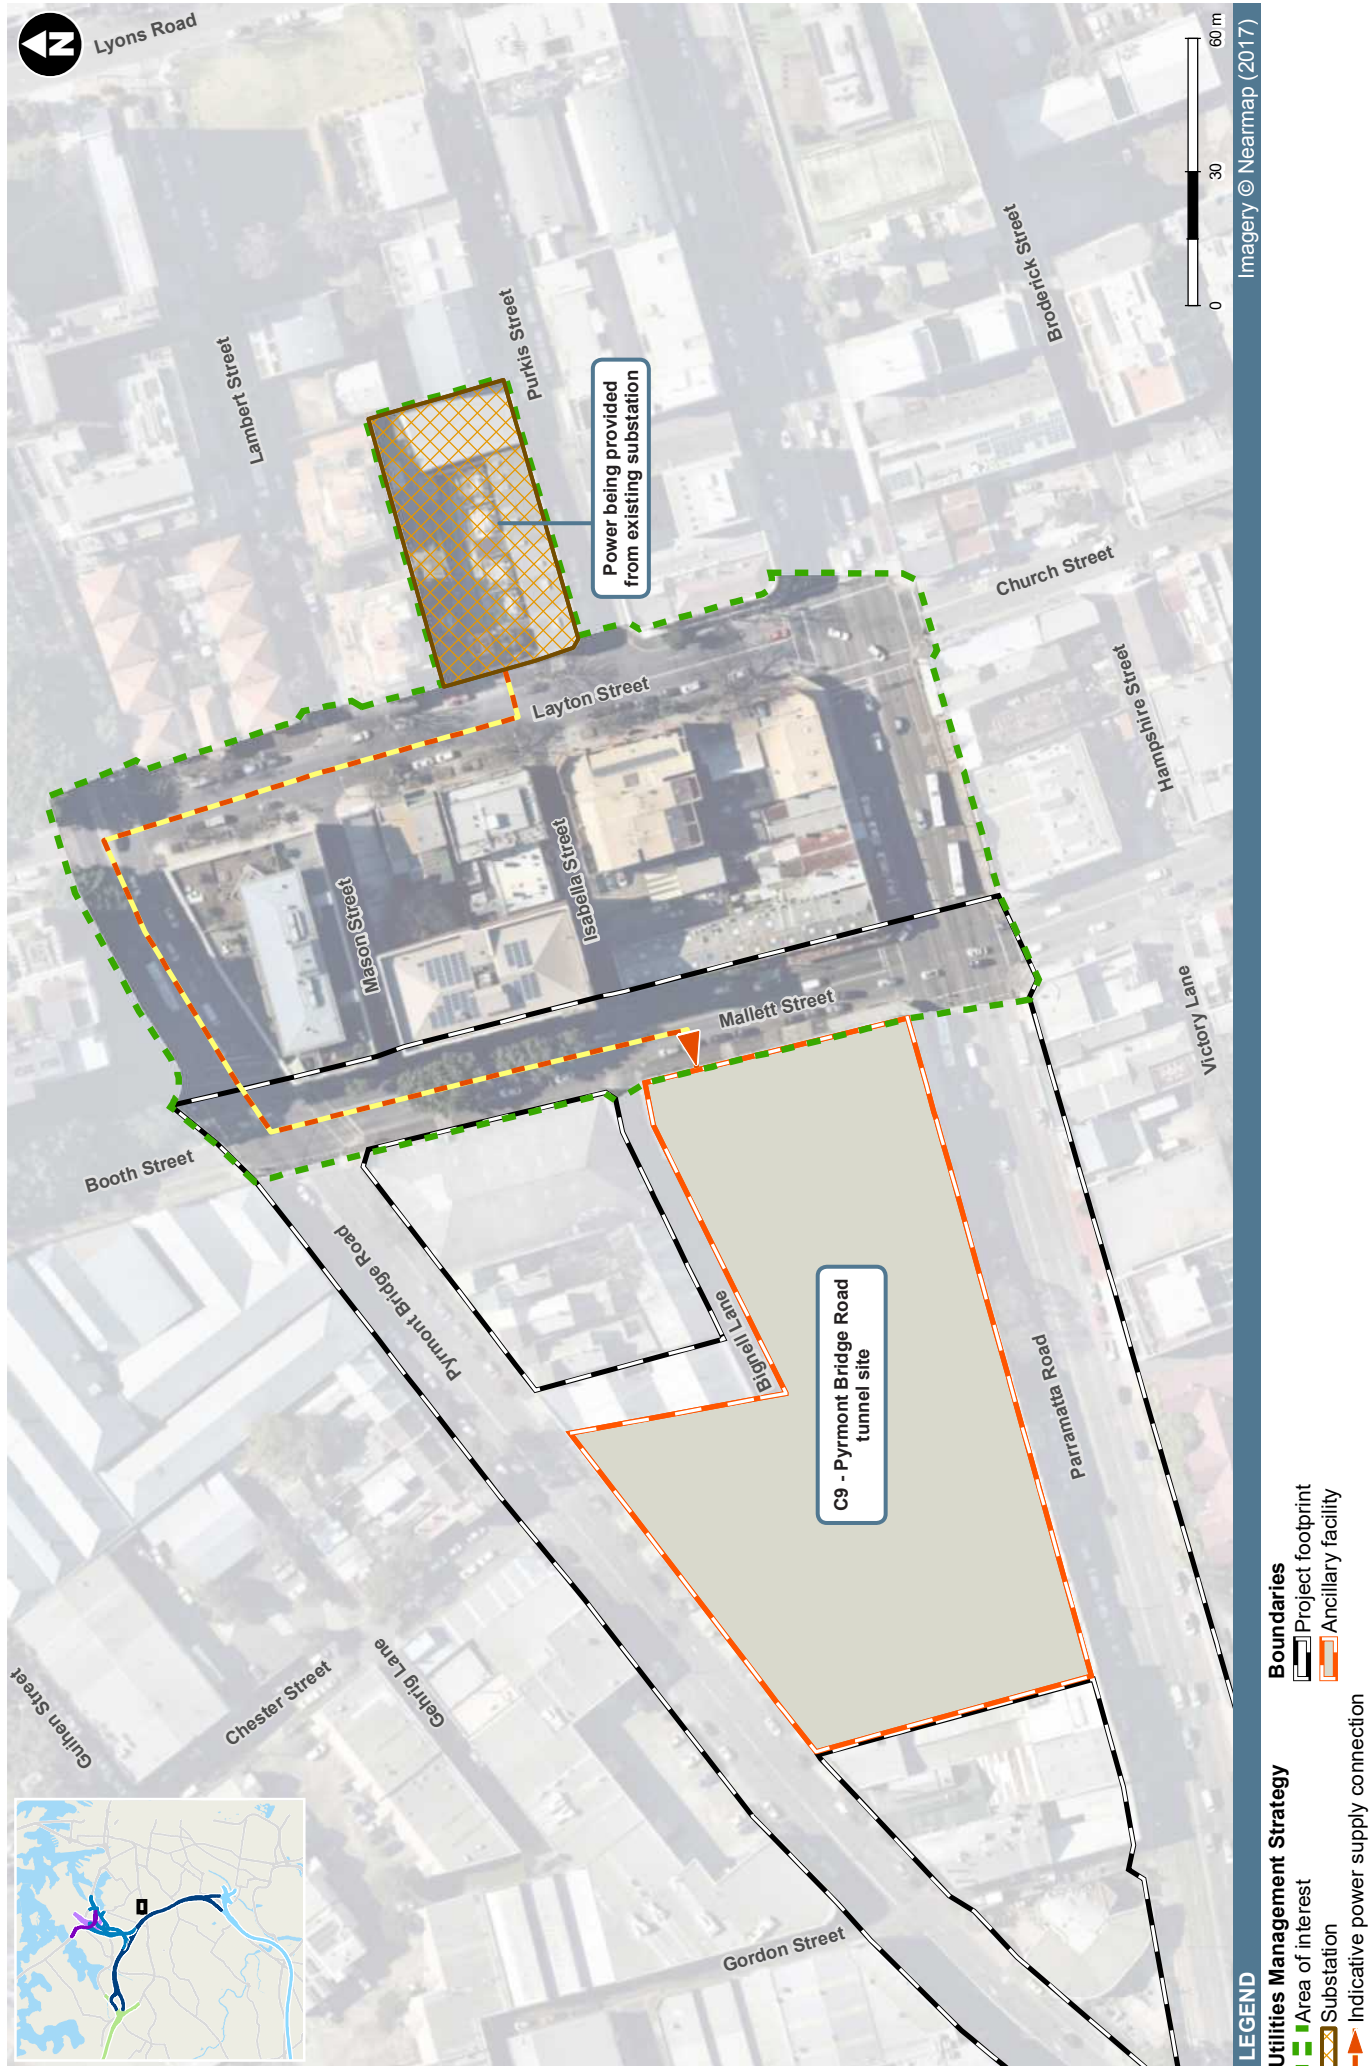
Construction power - Pyrmont Bridge Road, Annandale
